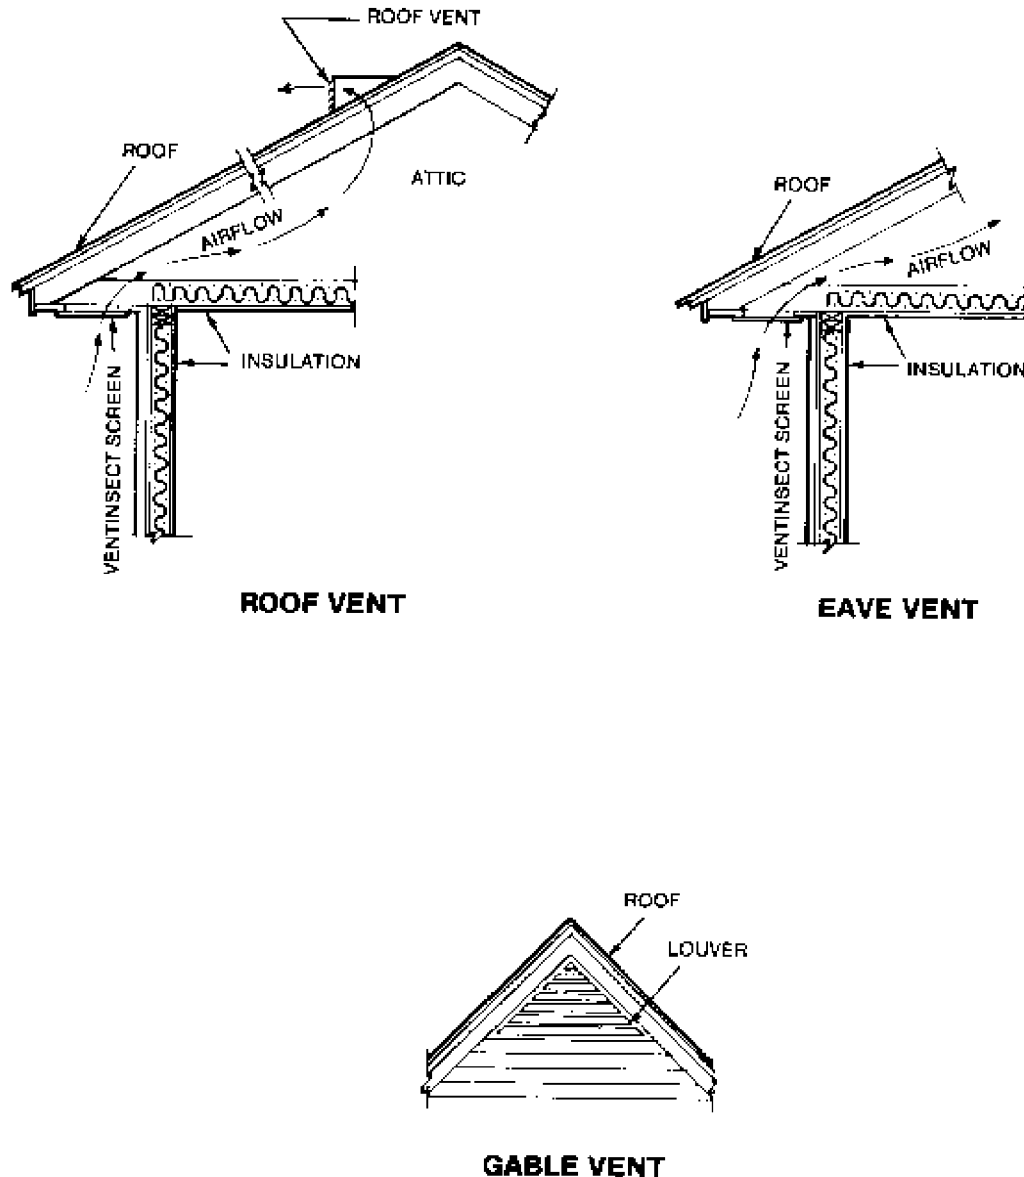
TYPICAL METHODS OF ATTIC VENTILATION.
